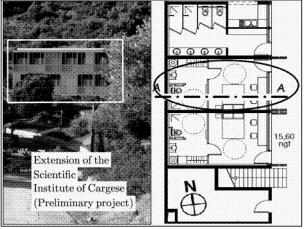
On site view of the future building and a plan view of a typical floor of the building
